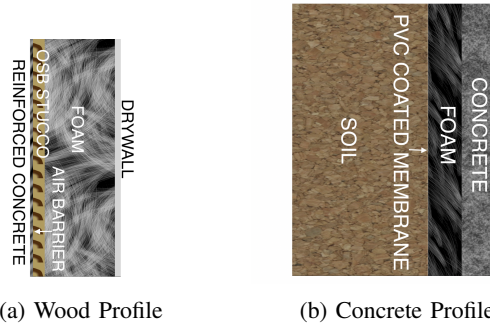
Thermal material profiles for a typical wooden residential structure and a concrete dome structure.
